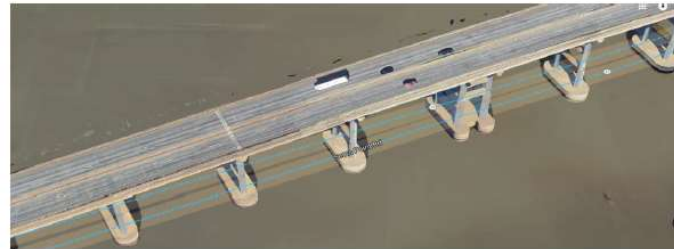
Aerial View of Columns, Pile caps, Bridge Spans
